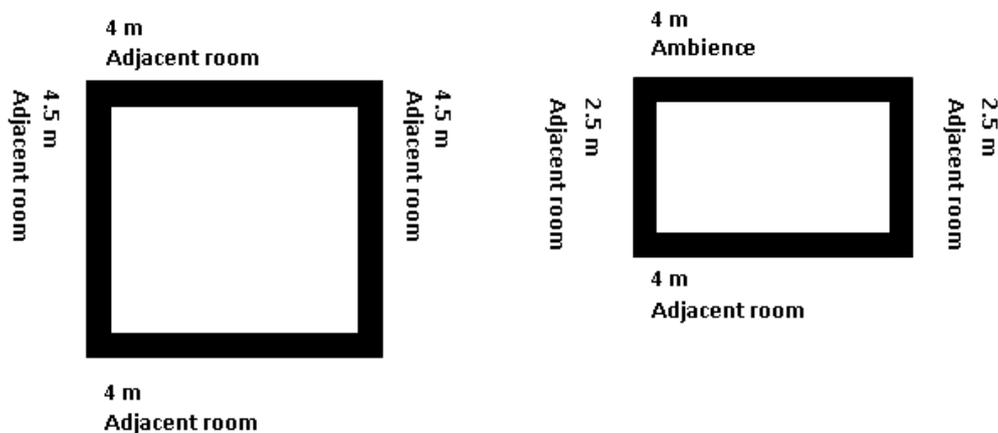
Size and alignment of walls in the meeting room and the office room respectively
